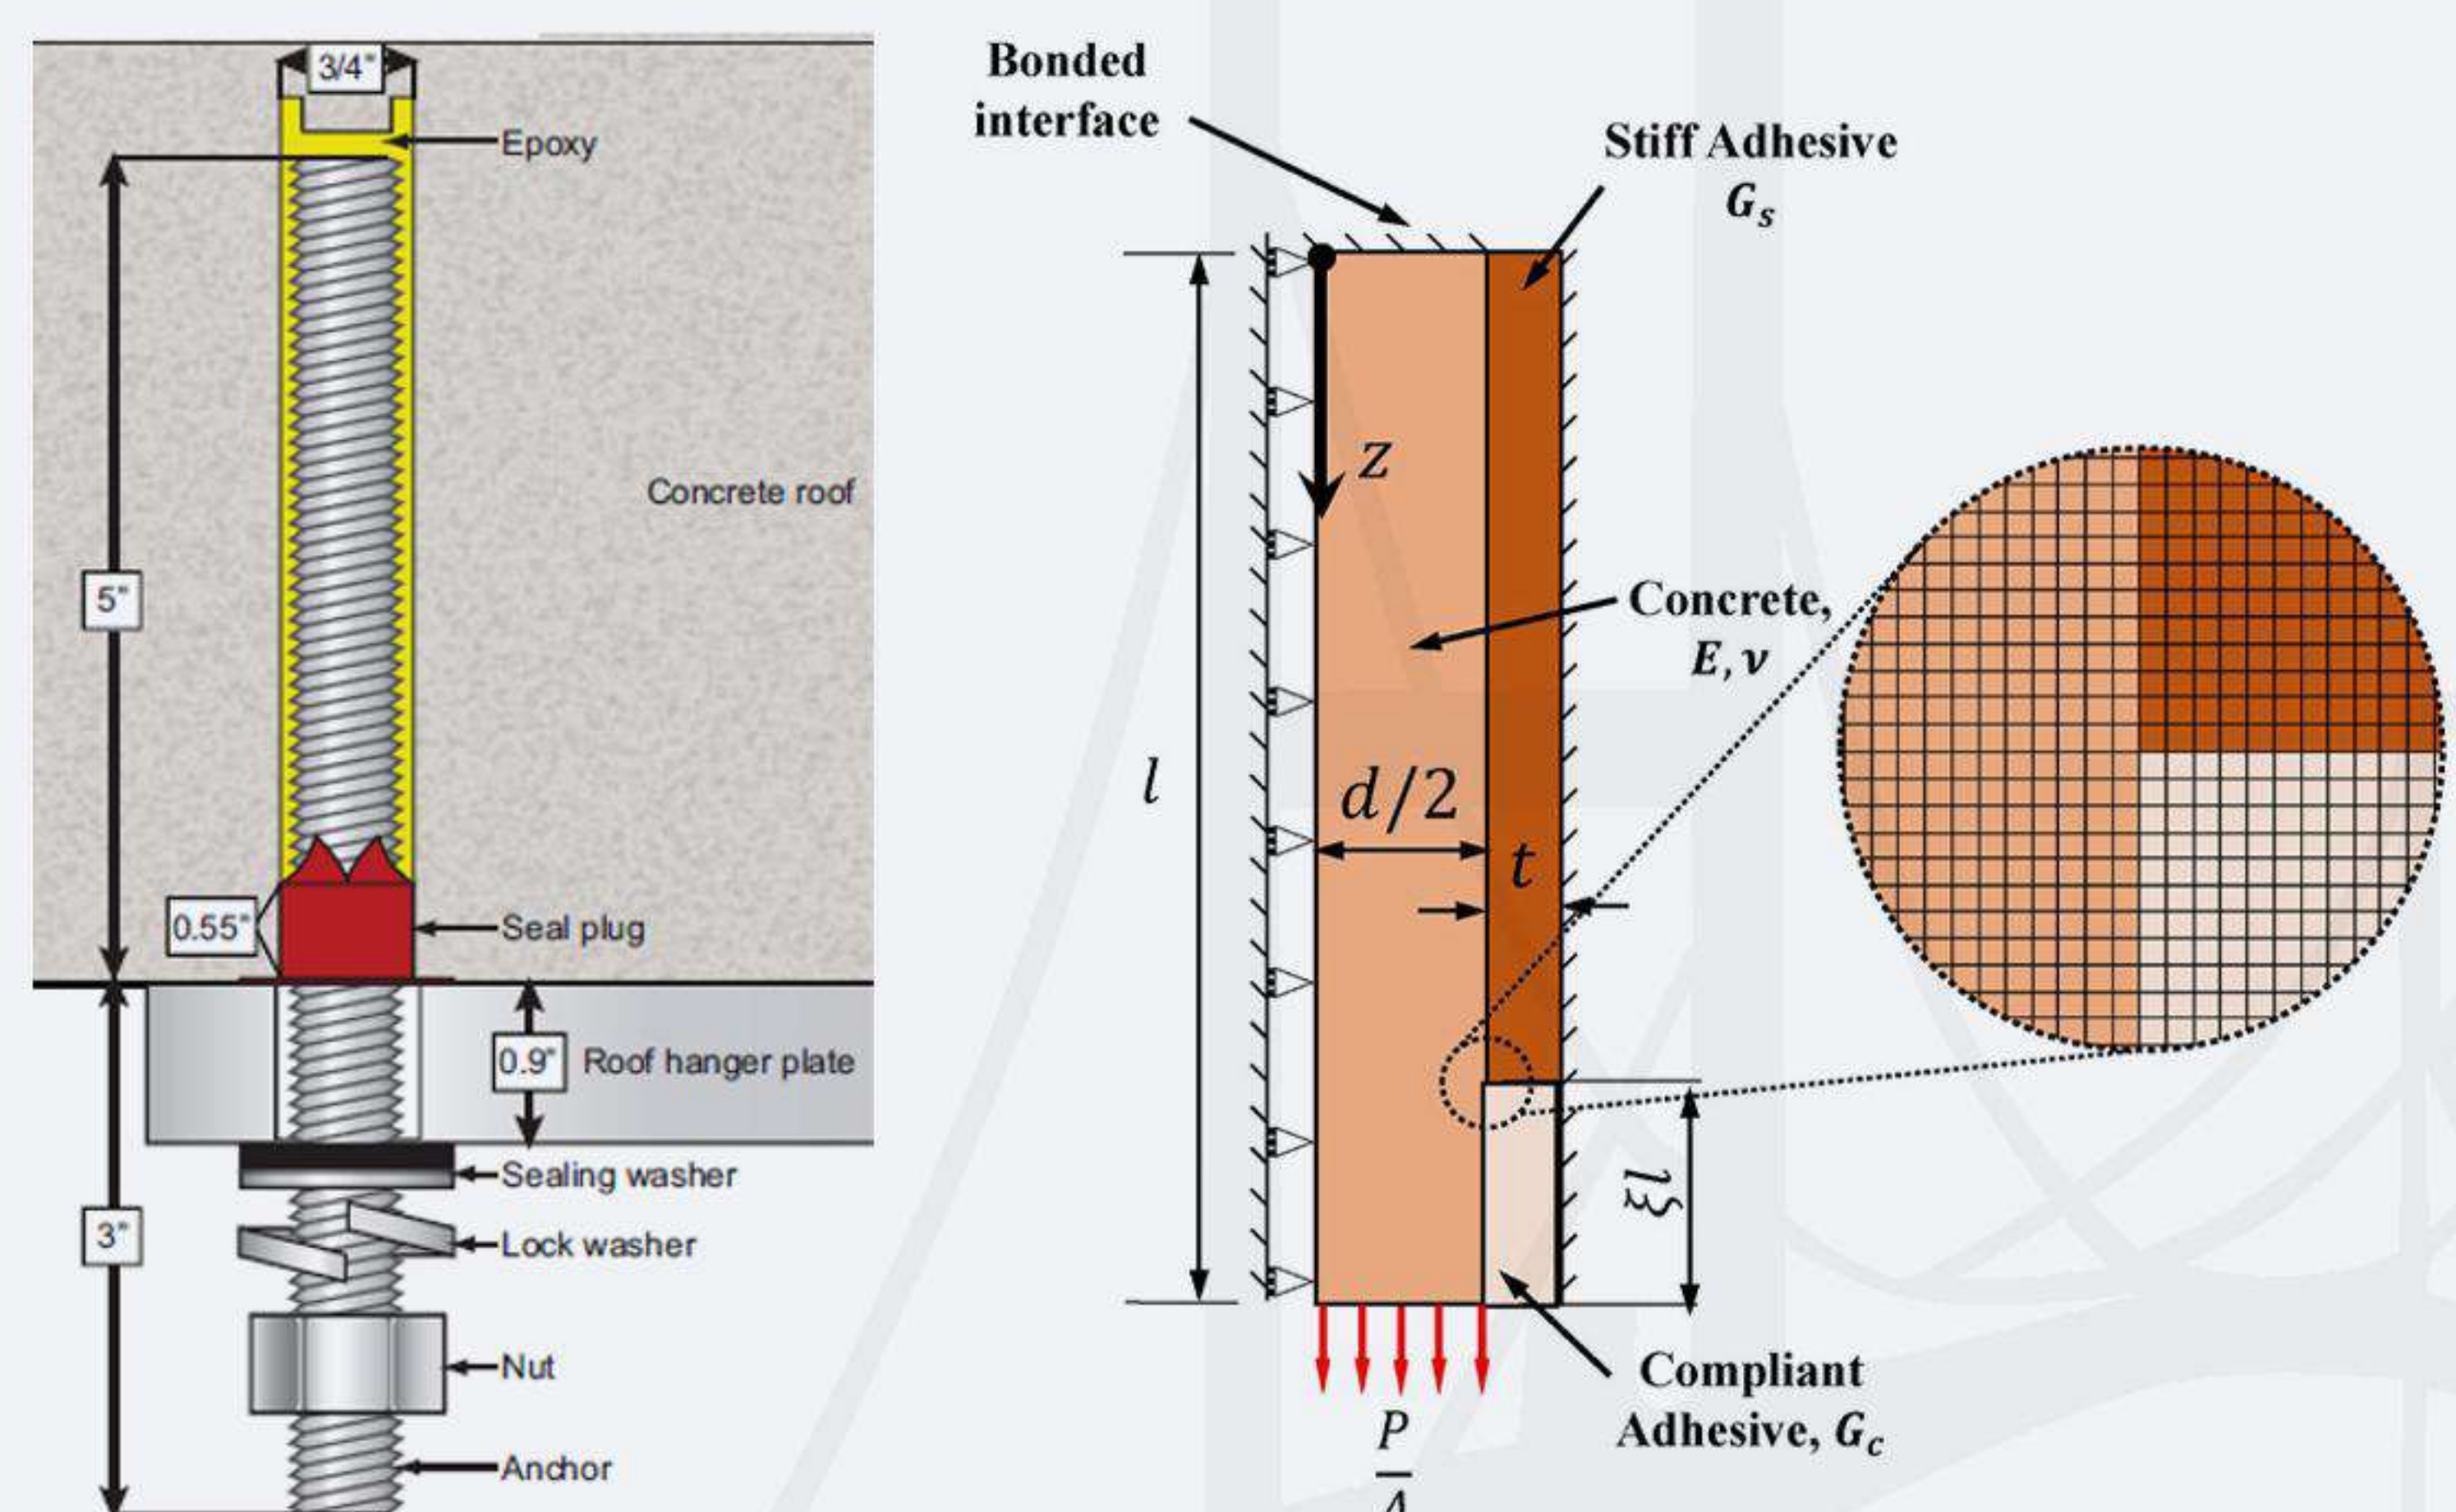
Typical configuration of an adhesive anchor and Finite Element Model
